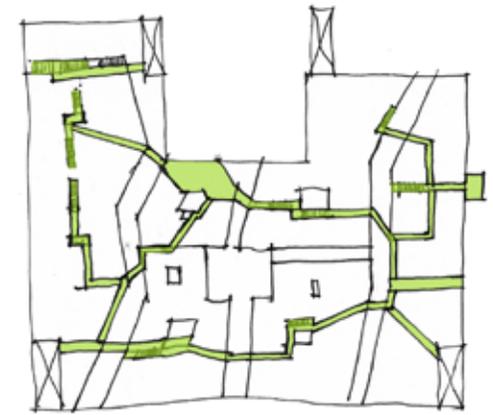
Proposed floor plan layout - indicating relationship between live and work units
